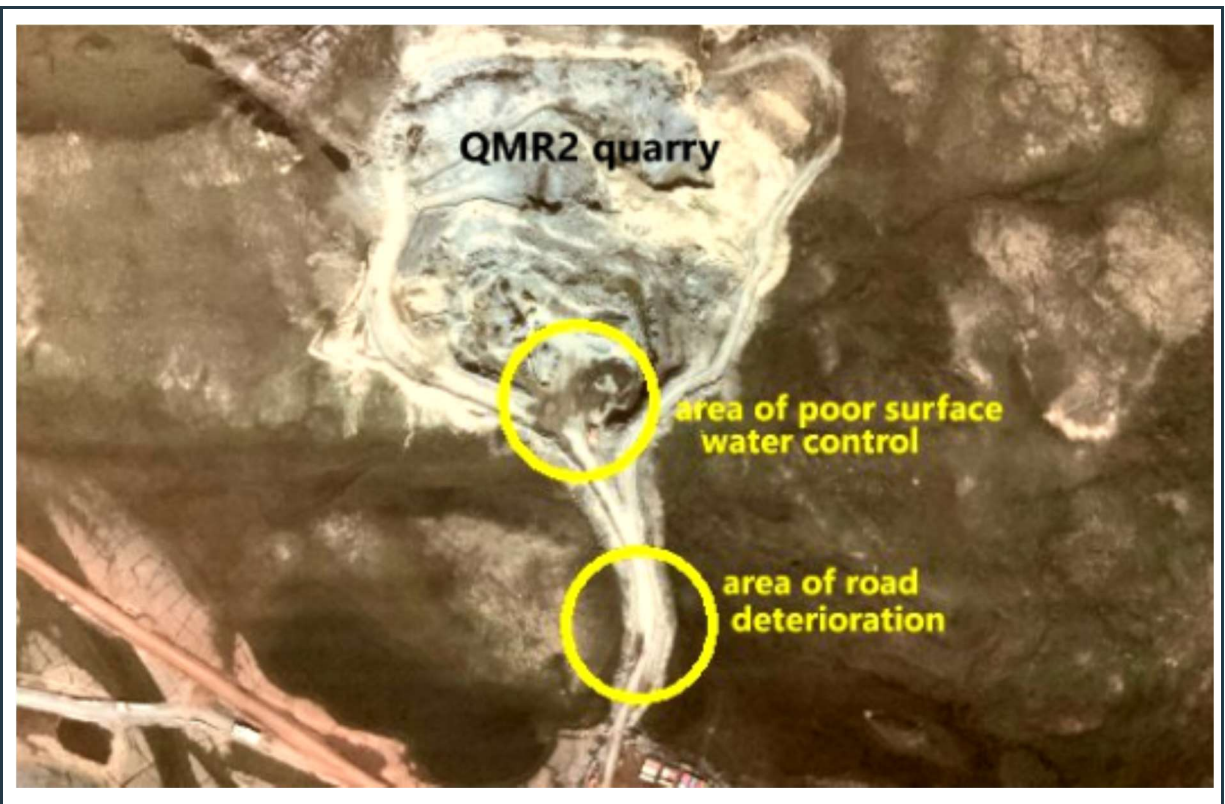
Site layout – Mary River Mine Site – QMR2 quarry area
